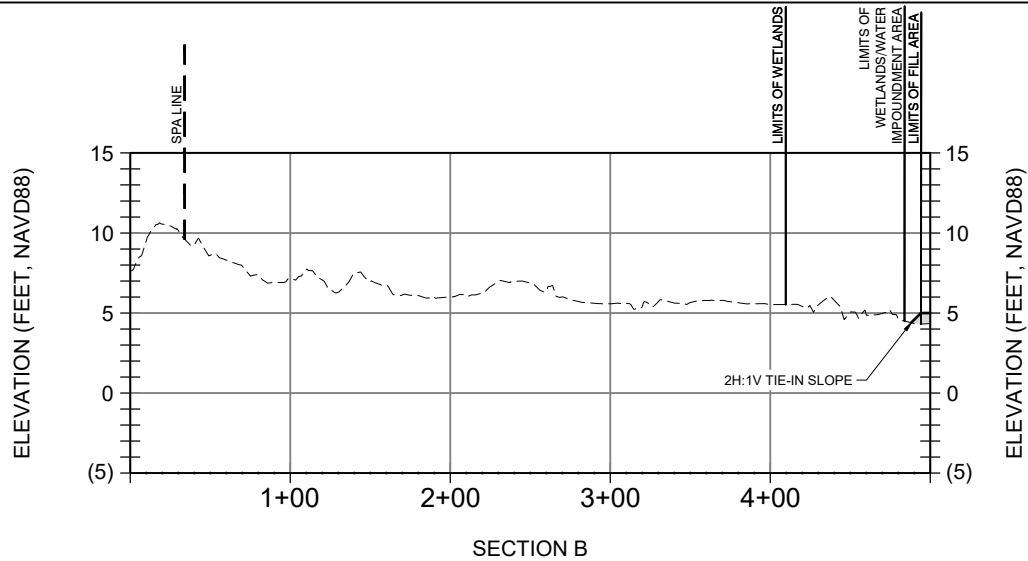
ALTERNATIVE 1 CROSS SECTIONS & DETAILS
